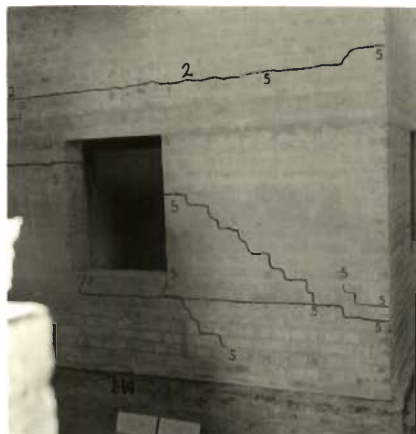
\_ A FINE HORIZONTAL CRACK MARKED BY 2 IN WEST WALL ( MODEL 7 )
